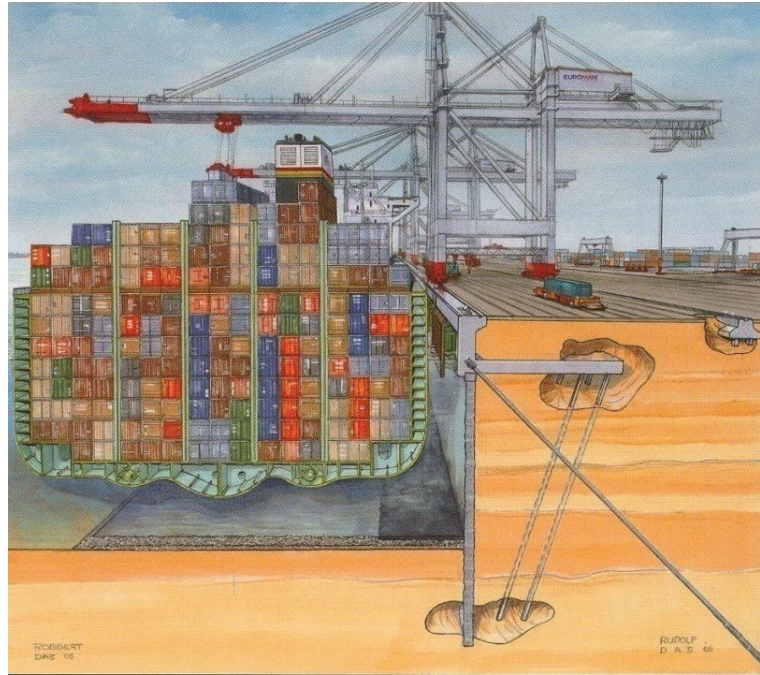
Cross-section of a quay wall at the Euromax terminal, Rotterdam [Gijt, 2010]
